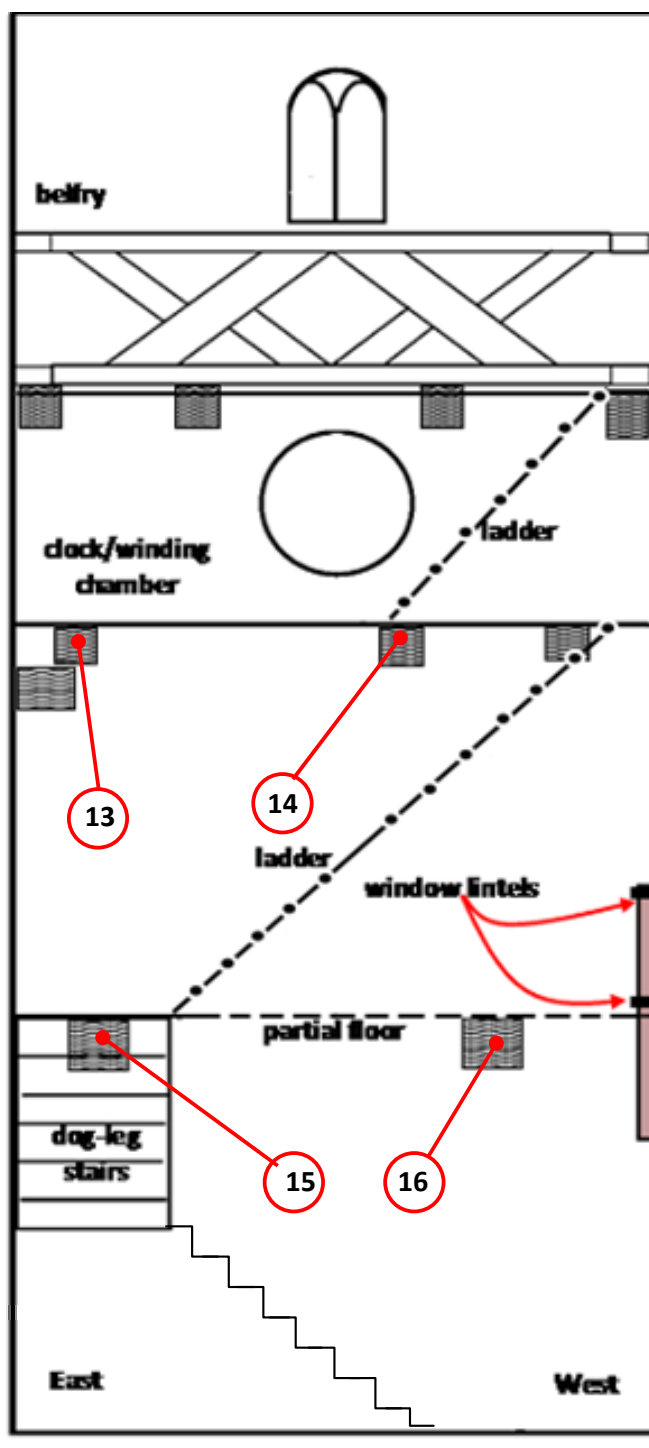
Section through Ravenstone church tower showing different features and some sampled timbers
